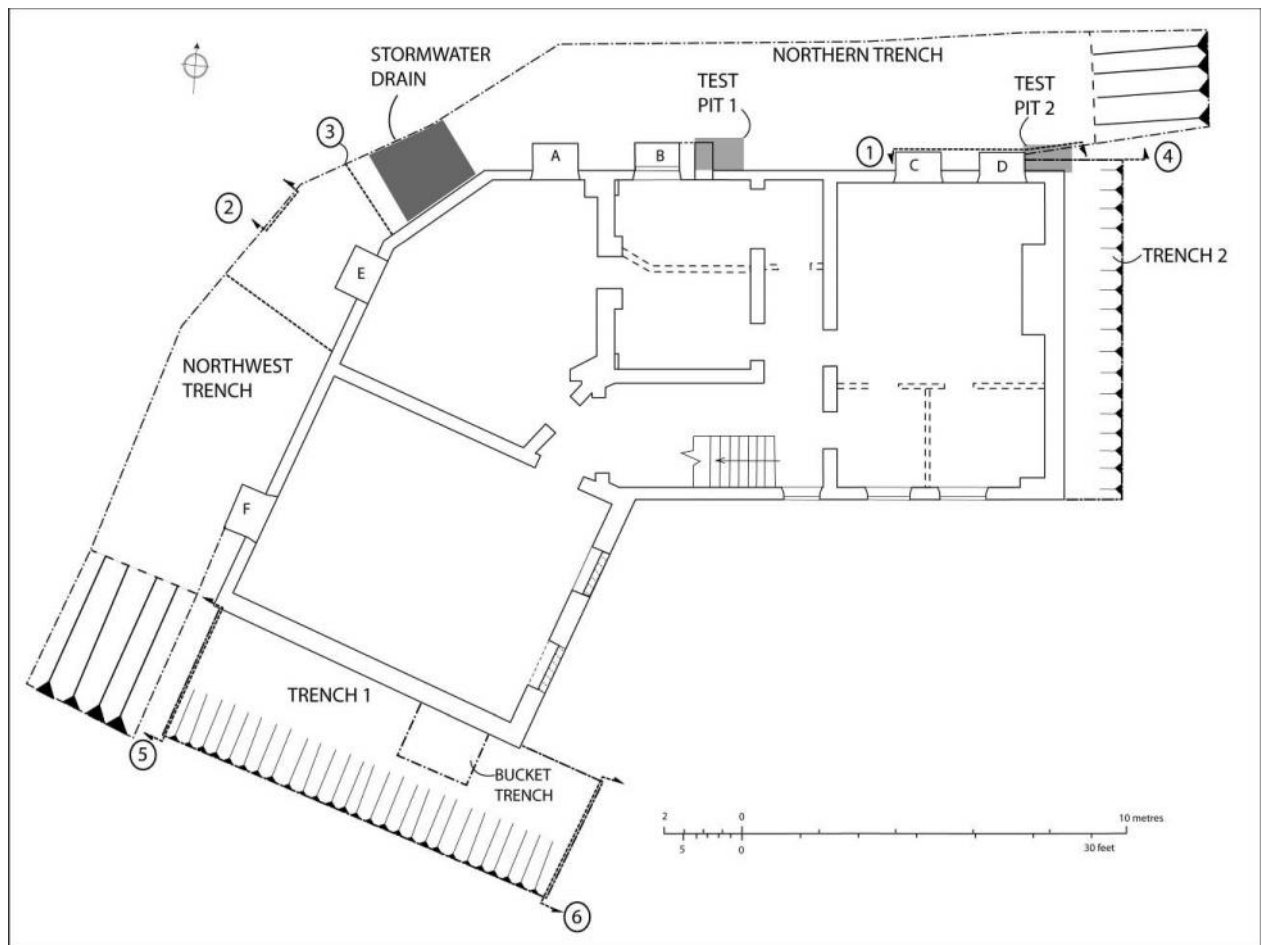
Plan of the northern trenches, the footings trenches (1 and 2) and test pits (1 and 2), the bucket trench within Trench 1, and the window boxes (A-d and F). E is the cellar door. Sections and plans referred to in the text are labelled 1-6, and are shown in Figure 37 and Figure 55. Sections of Test Pits 1 and 2 are shown in Figure 38
